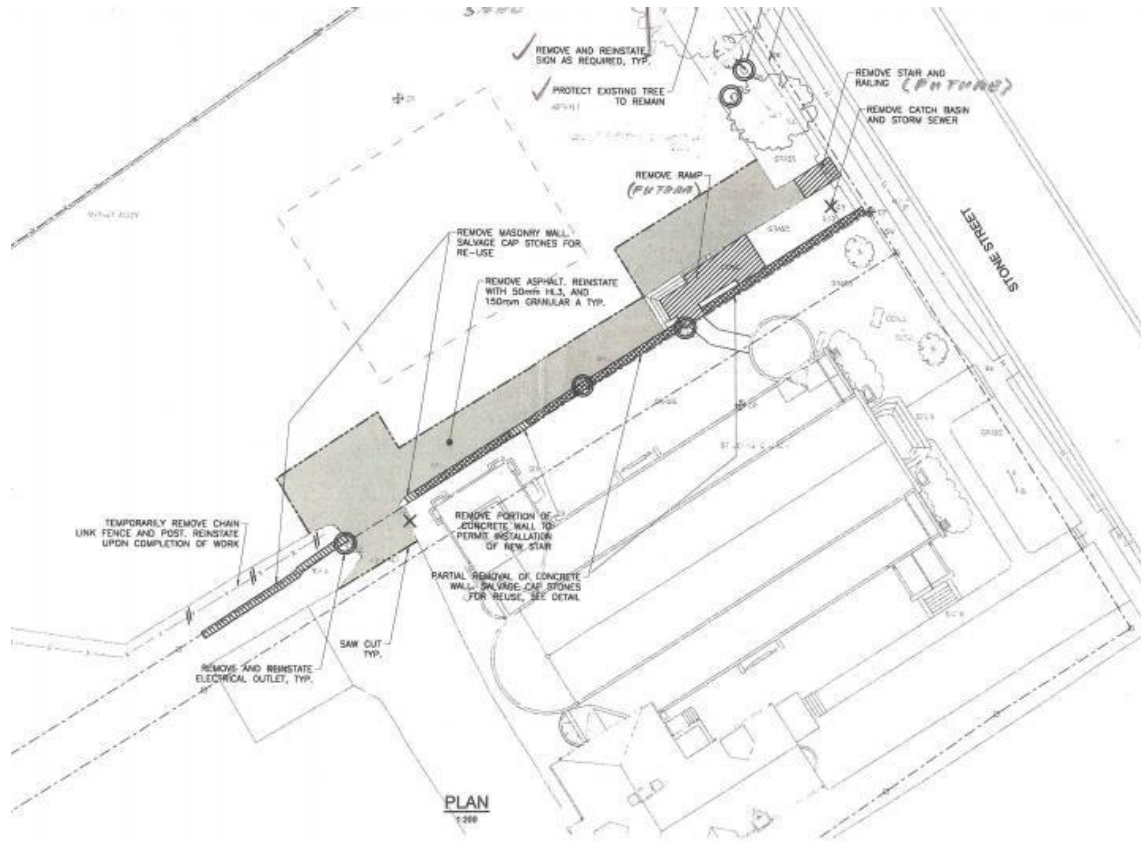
Site plan of St. John the Evangelist, showing Stone Street South to the east/right (McCormick Rankin Group, "St. Johns Evangelist Church, Retaining Wall Rehabilitation: Removals," April 2013, project no. 35 13006, drawing no. 2).
